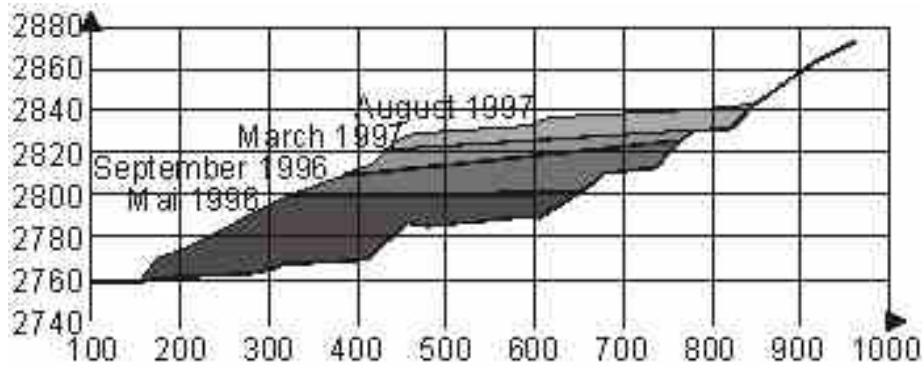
Longitudinal section of Zona II with details of construction periods.
